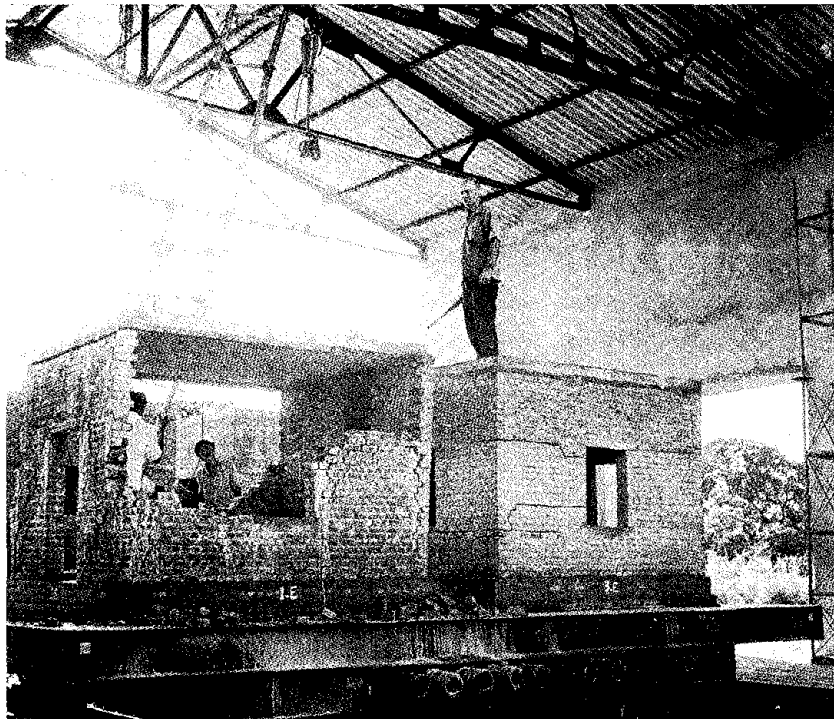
Removing Slab From Unreinforced Mud Structure
